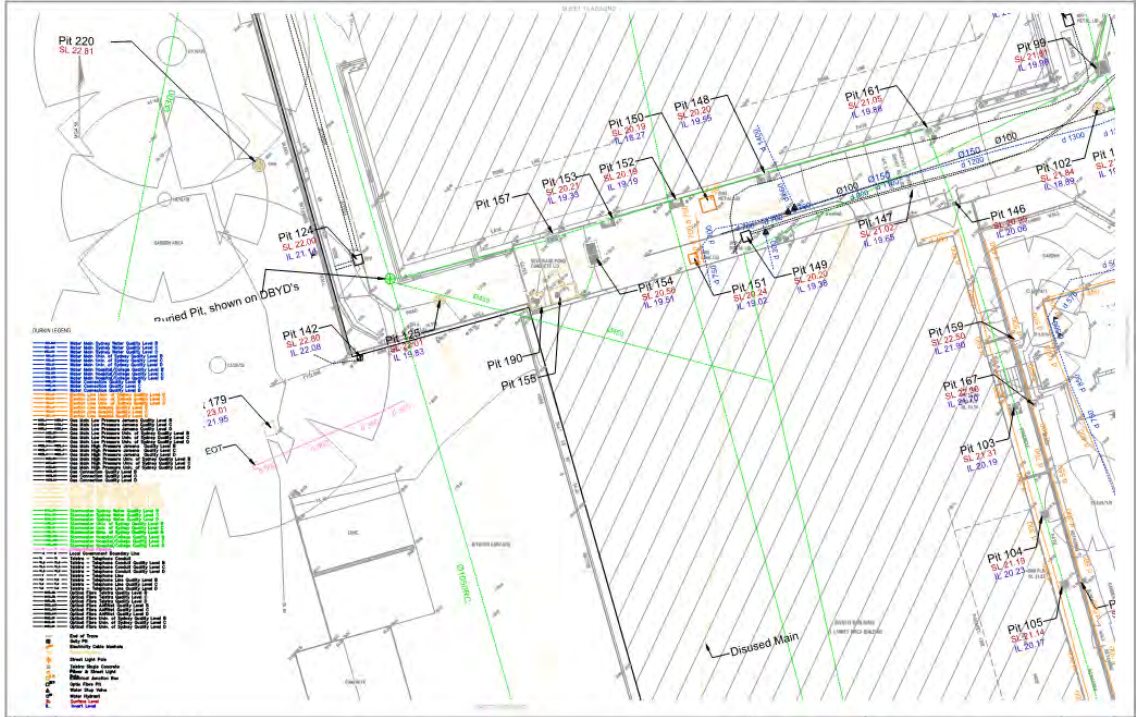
Site Survey – South side of Site (Source: RPS Sheet 10)
